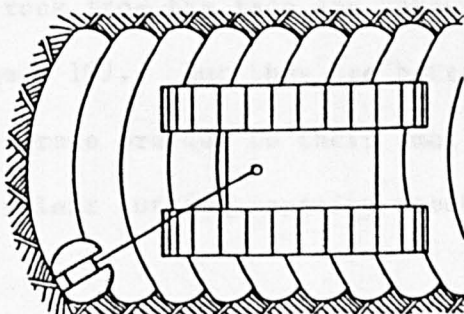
Roadheaders with Longitudinal and Transverse Cutting Heads
